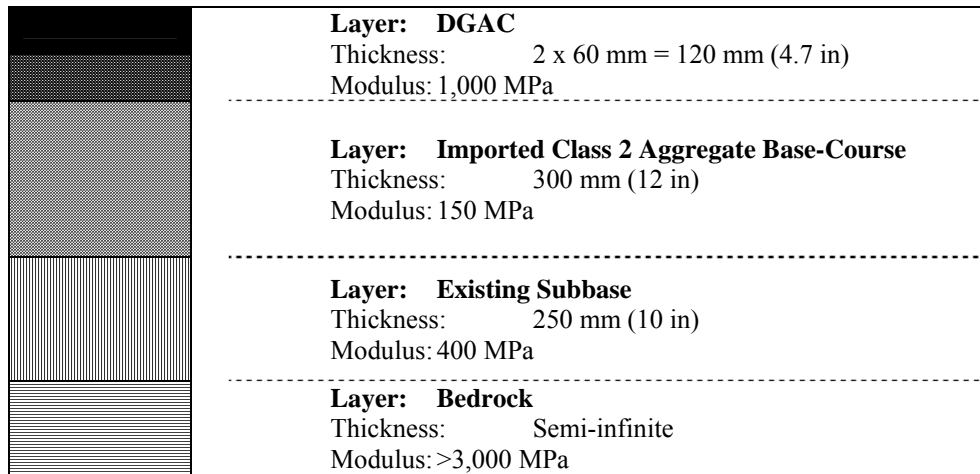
Pavement structure for warm-mix asphalt test sections.
